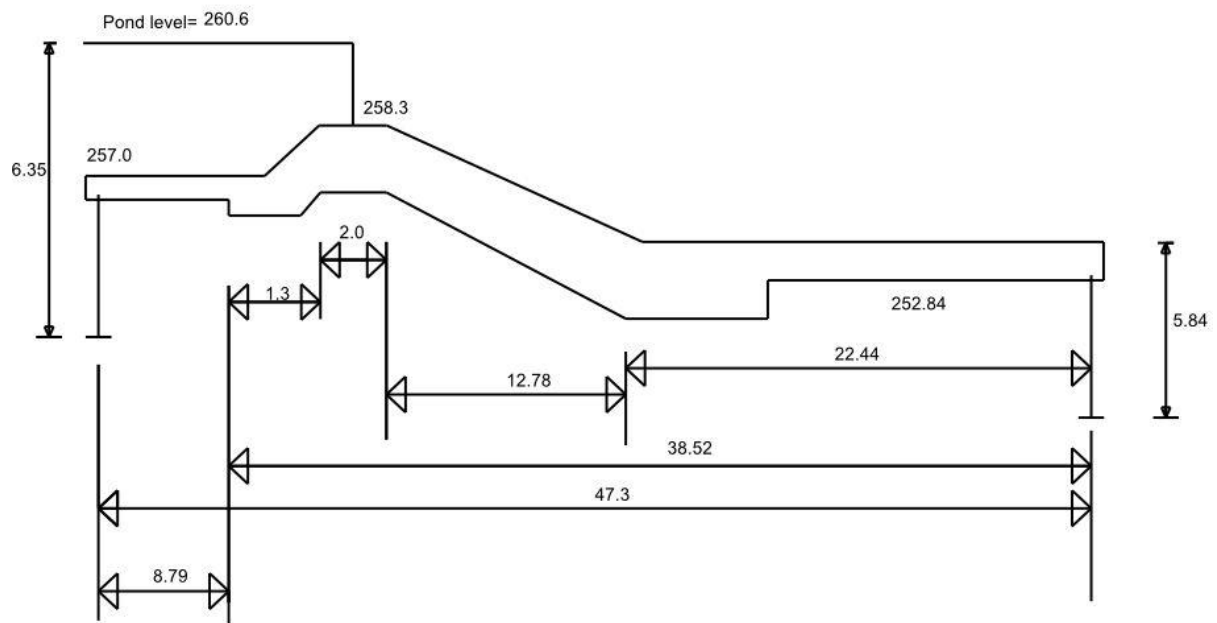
Other Barrage Bays Floor Section (ABCD v1.0)
